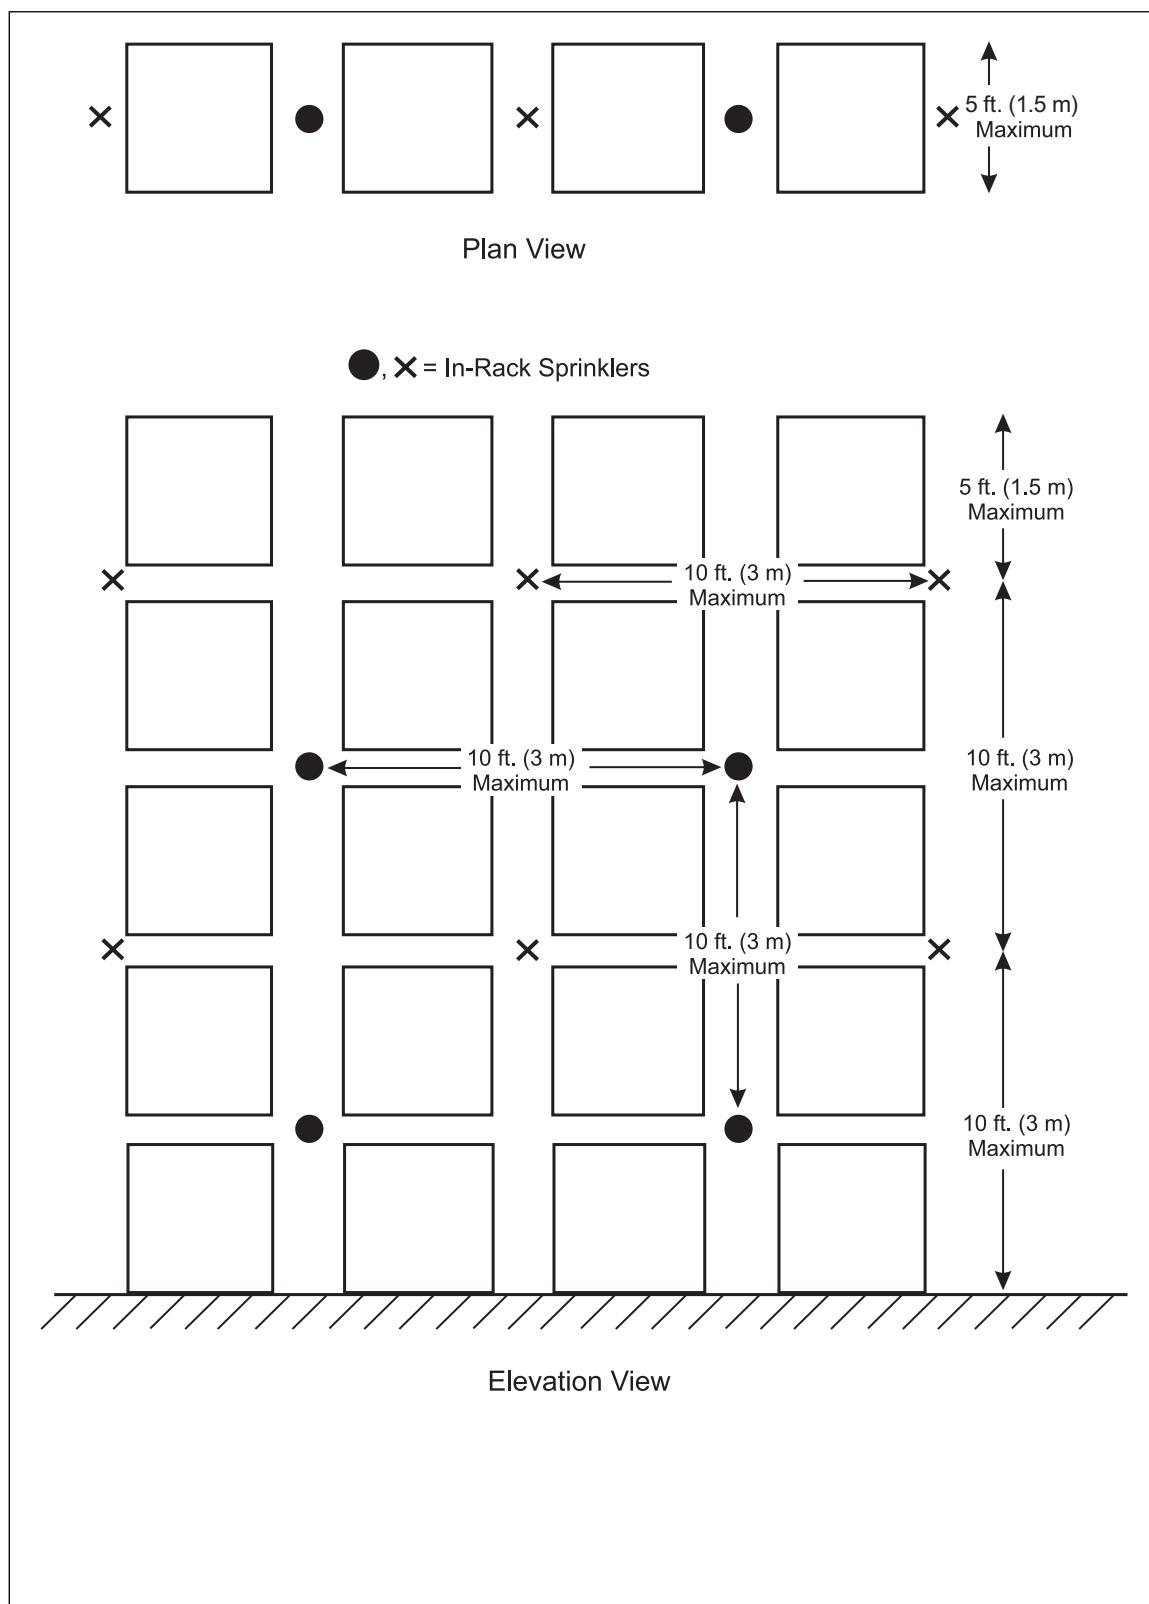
Single-row rack sprinkler layout: quick response sprinklers protection scheme
